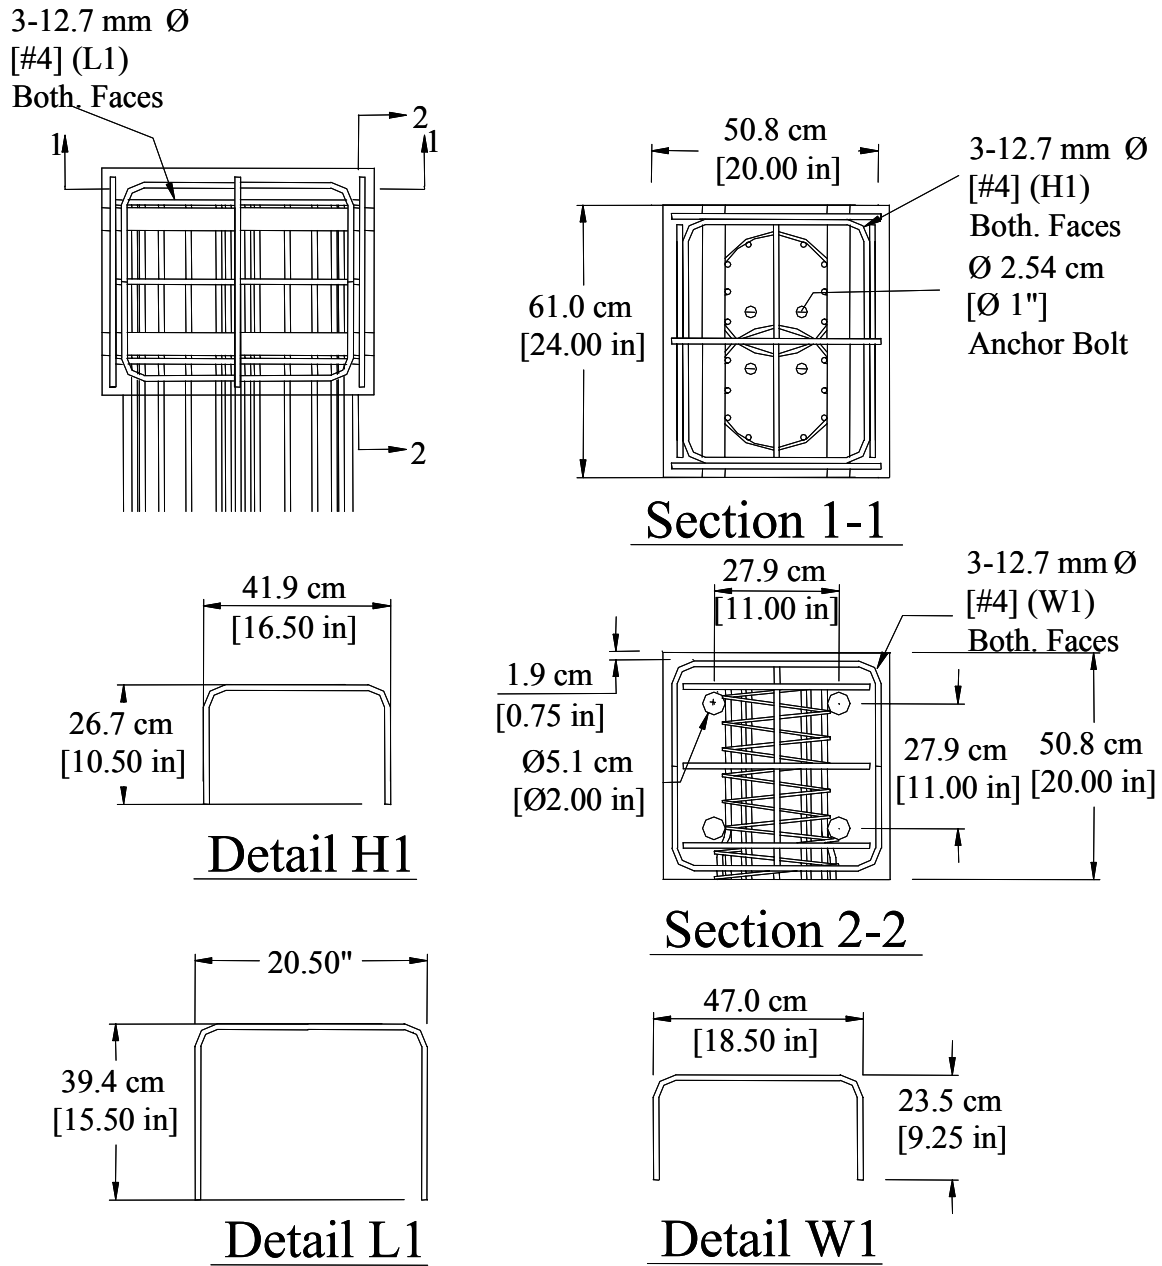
Plan and Section View of the Top Specimen Head with Low Shear
